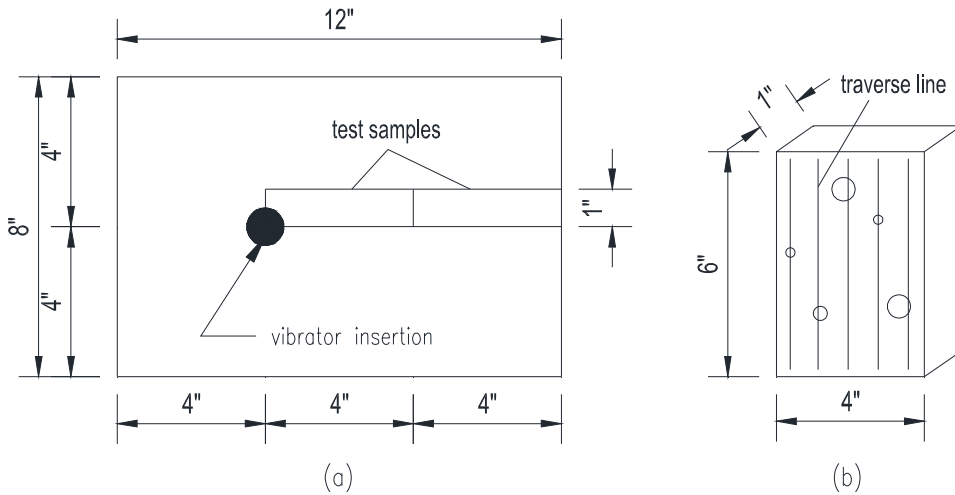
Vibrated specimen: (a) plan view; (b) C457 sliced sample
